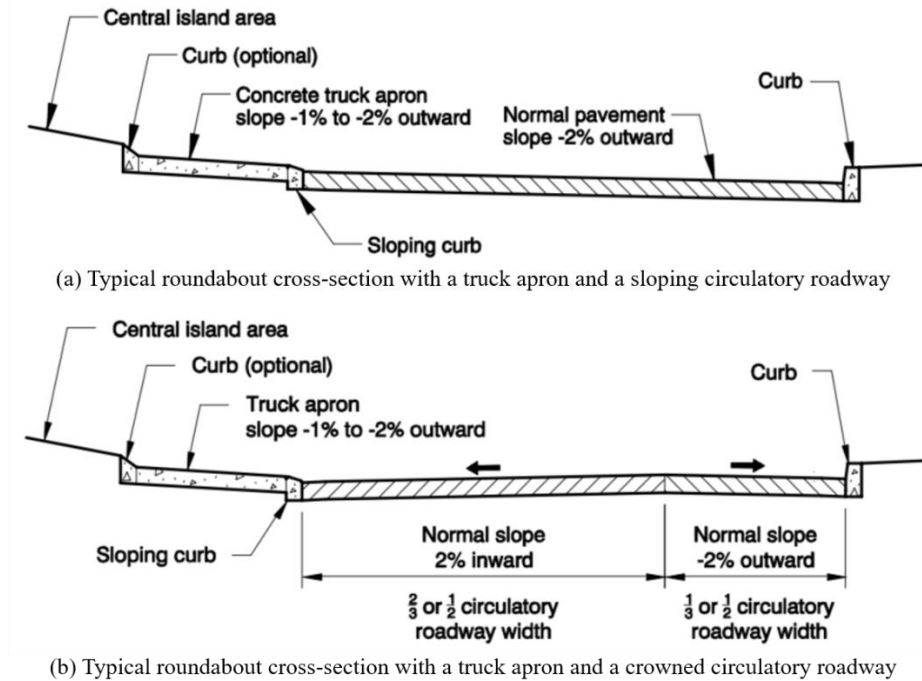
Typical roundabout cross-section designs [61]: (a) typical roundabout cross-section with a truck apron and a sloping circulatory roadway; (b) typical roundabout cross-section with a truck apron and a crowned circulatory roadway.
